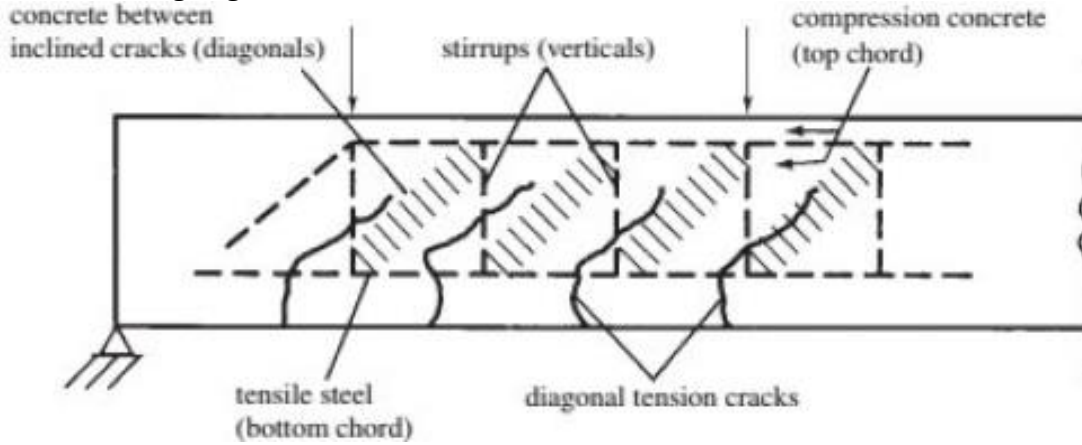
Placement of vertical stirrups through to mid-span of the girder.
